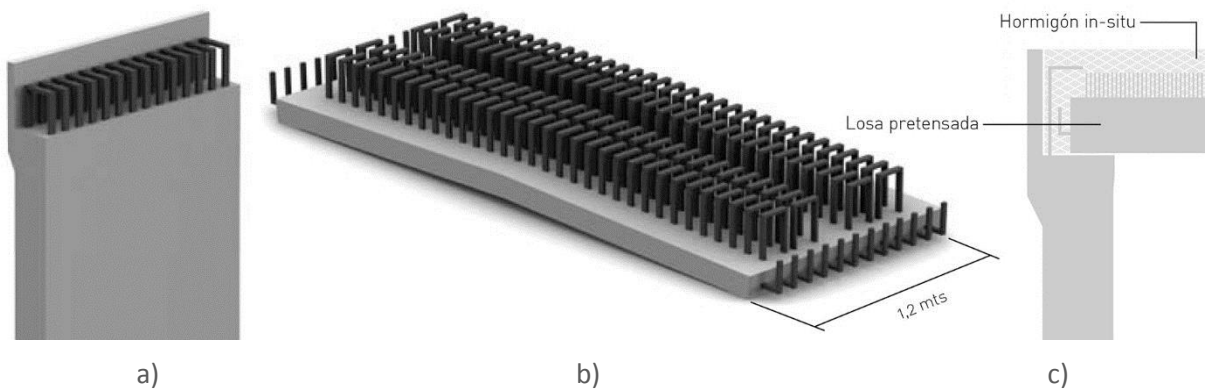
Details of the pre-fabricated bridge elements, a) upper part of the wall, b) the deck, c) the wall-to-deck connection, Forte (2010).
